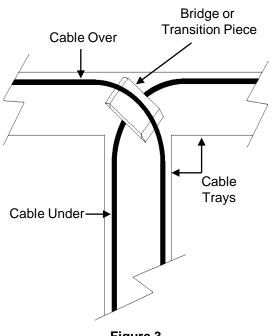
Tube Cables Crossing Using Bridge or Transition Piece
